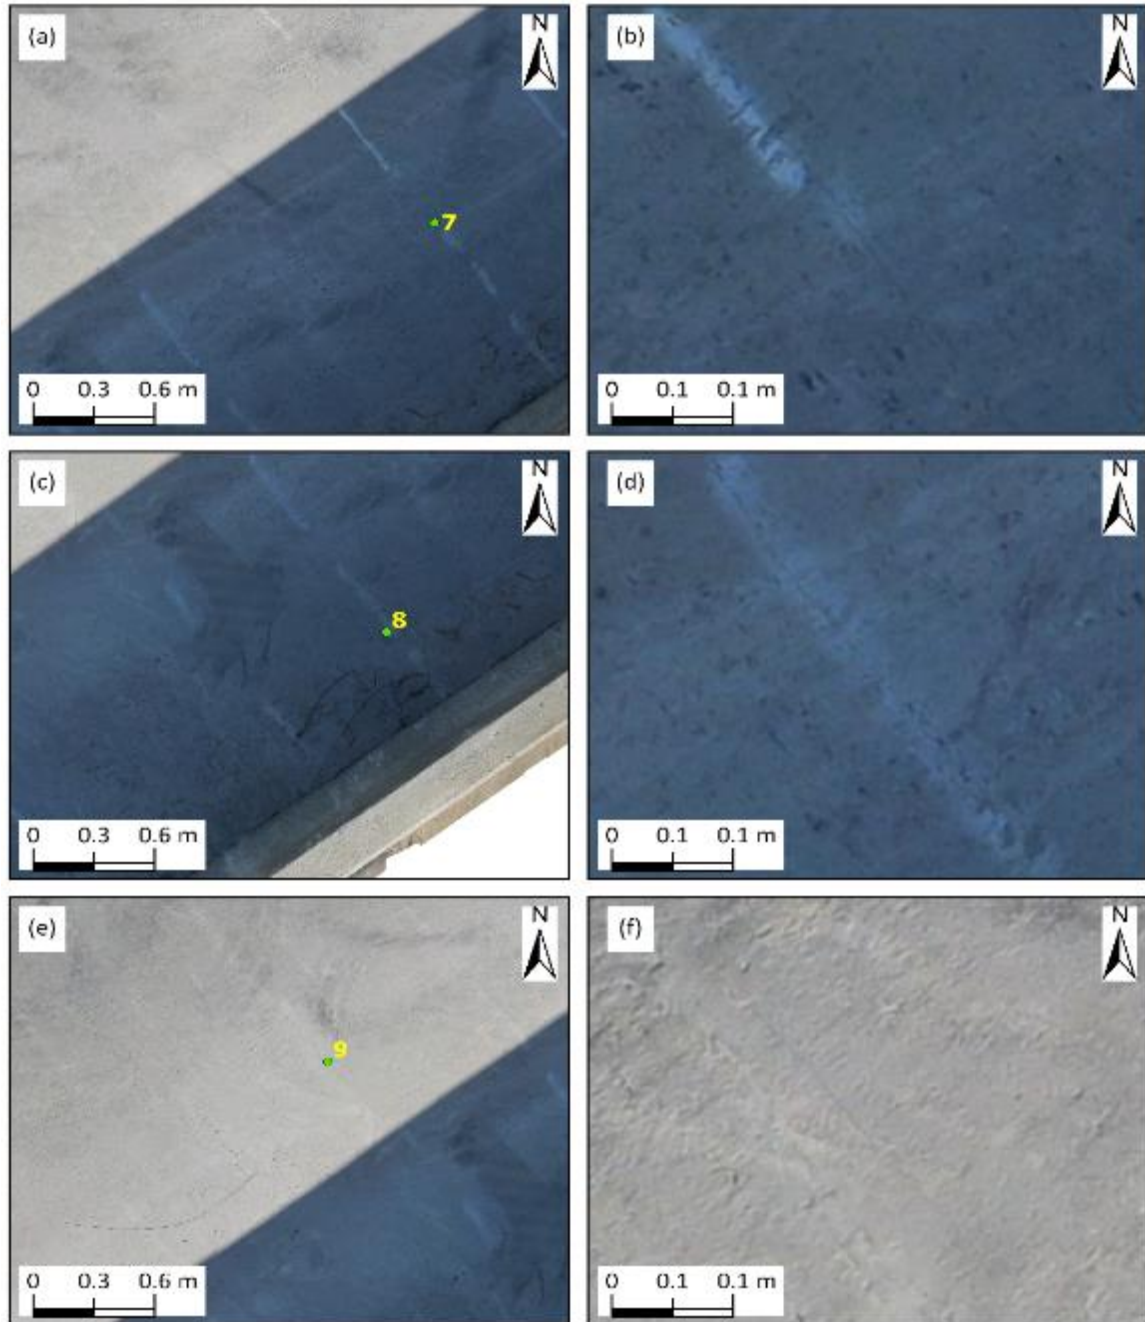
Cracks 7 through 9 at 0.035 in. (0.88 mm) GSD (1:30 zoom level on left and 1:5 zoom level on right)
